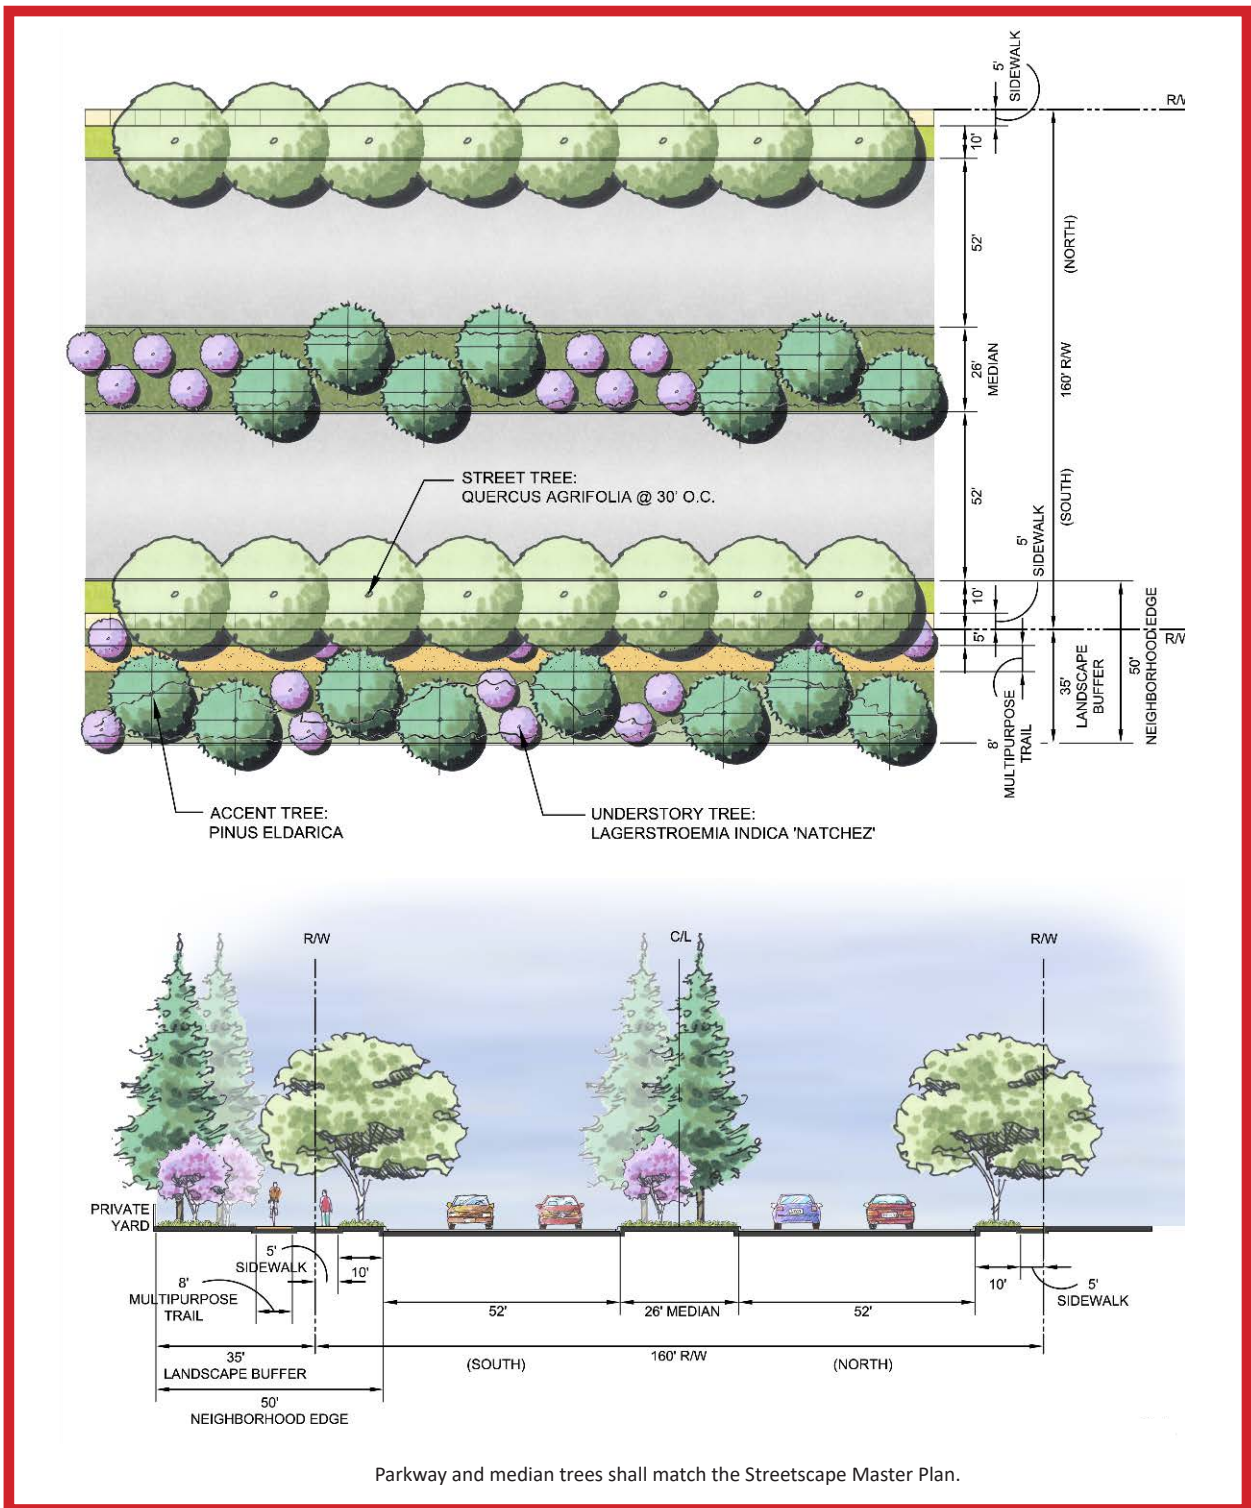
Ontario Ranch Rd. Streetscape
